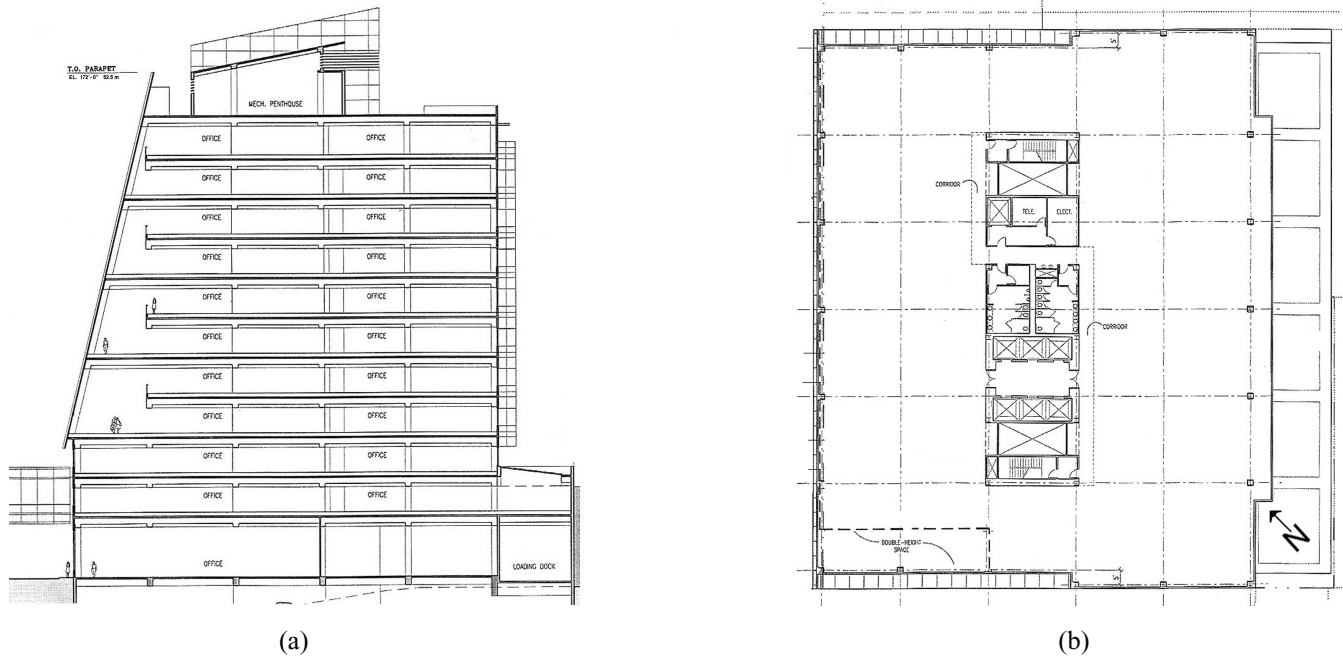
(a) Full building section cut through NW and SE curtainwalls. (b) Plan for typical office floor.
